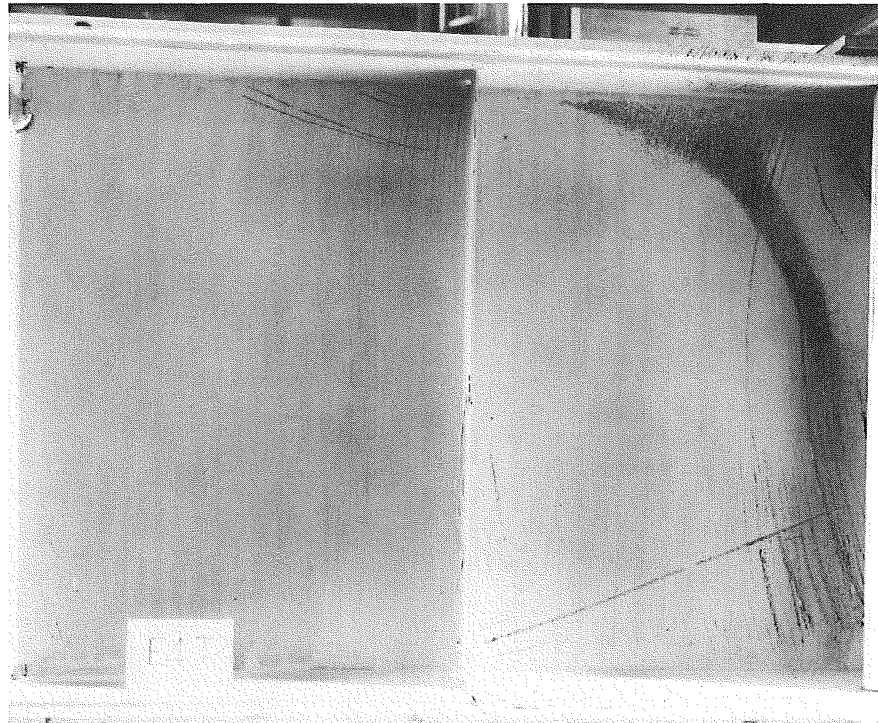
Failure of Girder E4 in Test 2, Far Side
